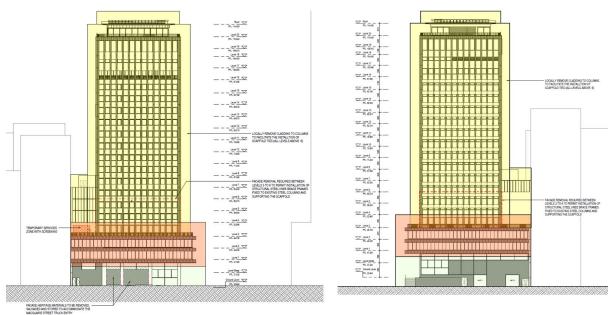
Macquarie Street (left) and Pitt Street (right) elevations showing hoarding, scaffolding and temporary services zone with screening
